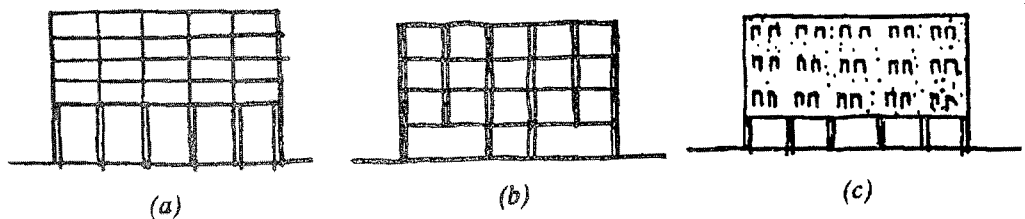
“Soft” first story (a) tall, flexible columns,
